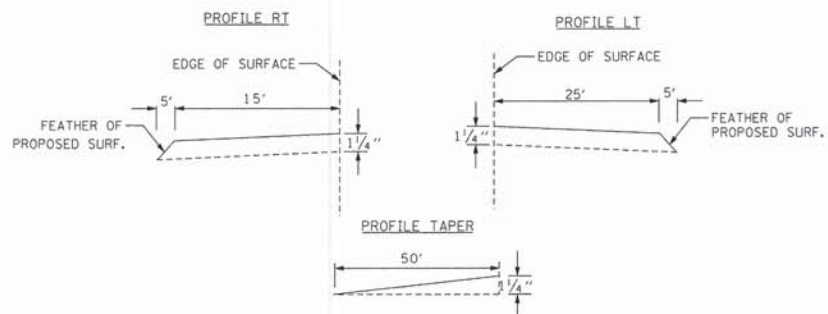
DETAILS OF SURFACING AT INTERSECTIONS AND SIDEROADS
